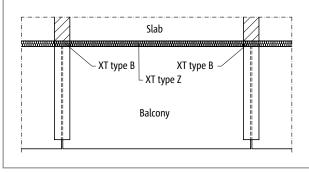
Schöck Isokorb® XT type B: Balcony construction with freely cantilevered downstand beams (prefabricated balcony)
